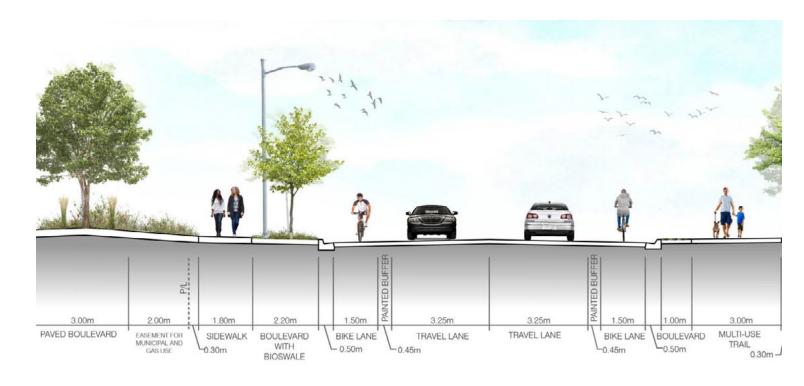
Typical Streetscape Cross-Section for Copper Street and Titanium Drive
